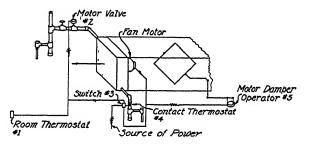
ARRANGEMENT OF AUTOMATIC CONTROL FOR A UNIT HEATER
